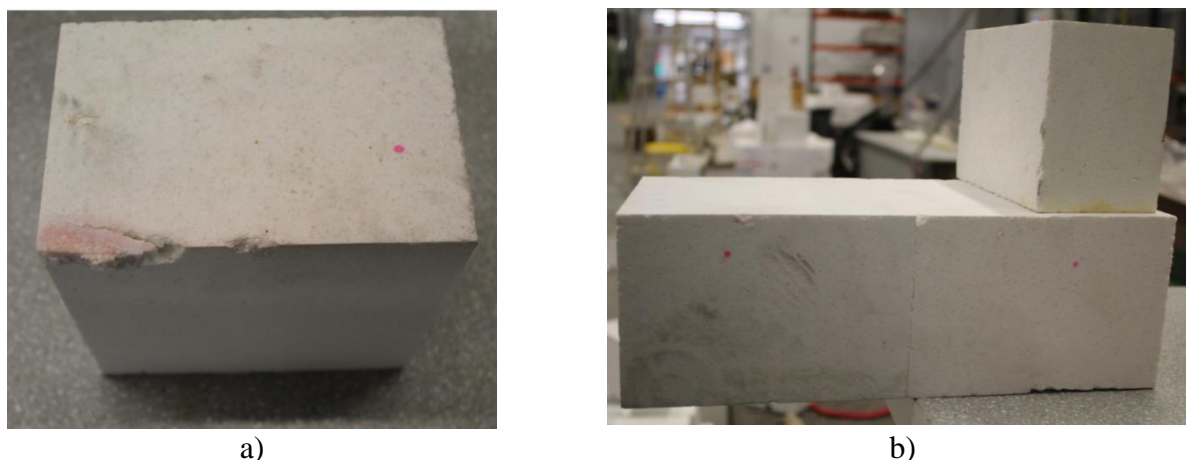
Test series S09.HT.CBJ – Failure at the head joint: a) Crushing; b) Bricks stuck together
